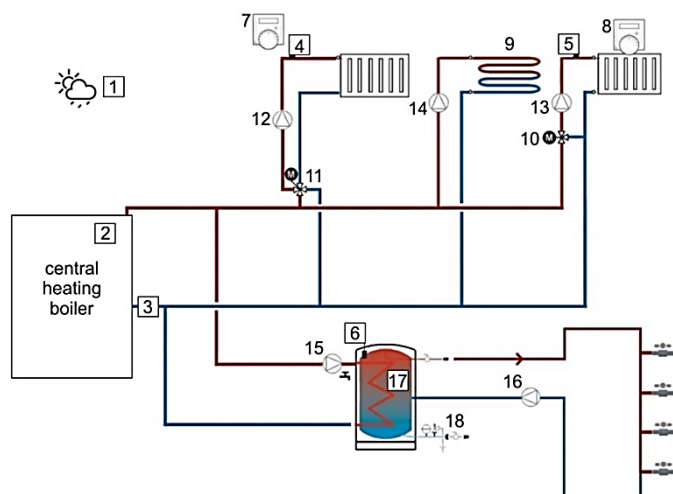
Schematic diagram of central heating and domestic hot water installation [14]
